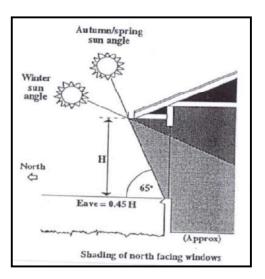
demonstrates the shading of north facing windows in buildings with optimum orientations. Eaves on north facing walls should be designed to completely shade windows in summer but allow the sun to shine through in winter. To calculate the distance the eaves should overhang, from the base of the window on an elevated plan, draw a line at 65°. Methods for shading the glass with awnings vegetation should be or considered.
